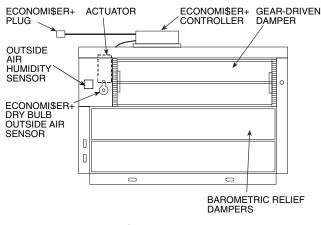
EconoMi\$er+ Component Locations — 3 to 6 Ton Units
